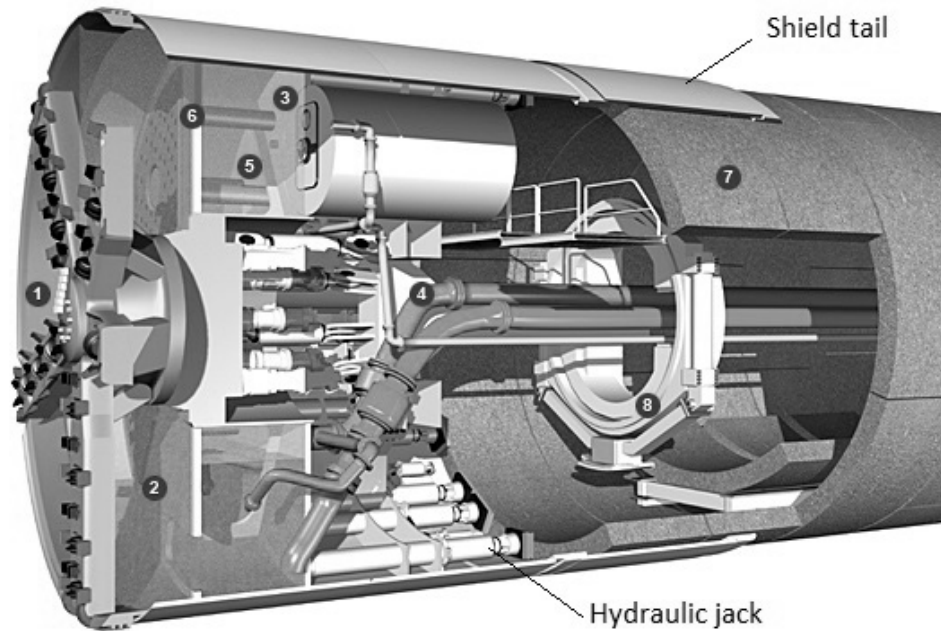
Typical overview of a closed face slurry shield TBM: (1) cutterhead, (2) excavation chamber, (3) bulkhead, (4) slurry feed line, (5) air cushion, (6) diving wall, (7) segmental tunnel lining, (8) segmental erector. Source: Herrenknecht AG.
